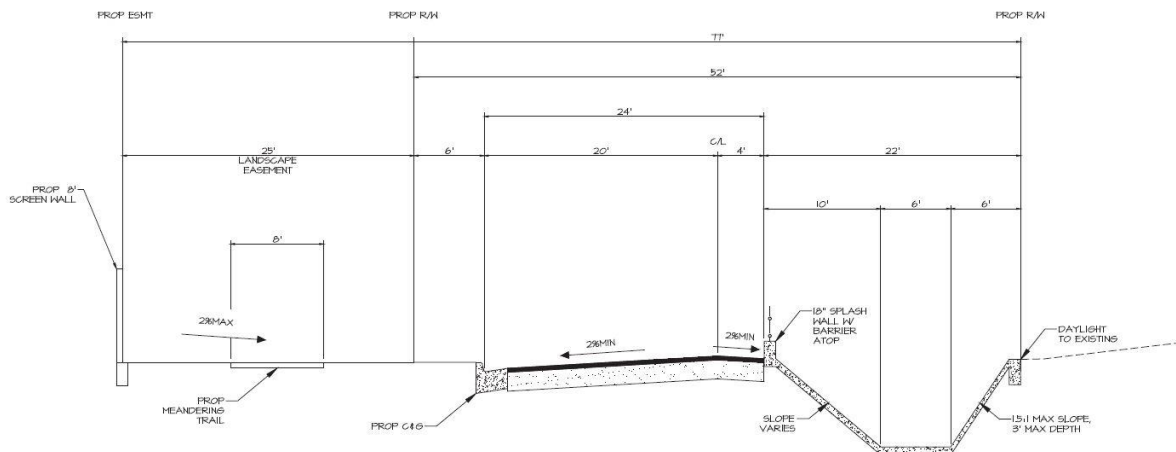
C Typical Beckwith Avenue Cross Section - South
